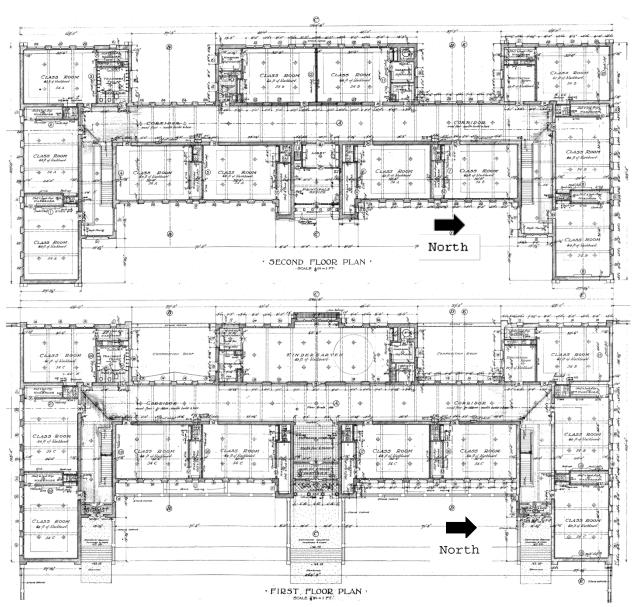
Fanning School First and Second Floor Architectural Plans (Courtesy of St. Louis Public Schools).
